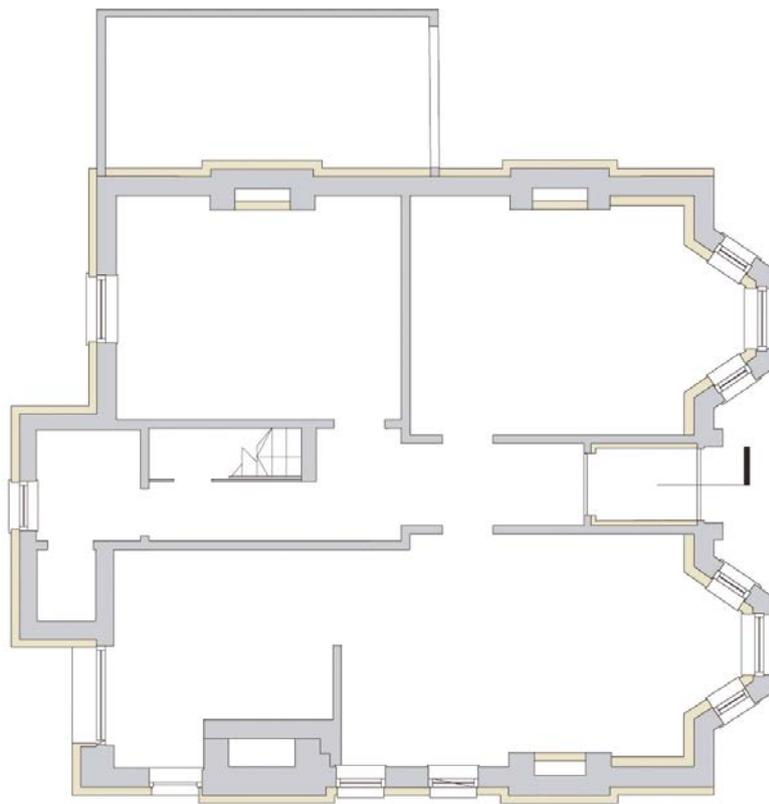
Ground floor plan - Marion Baeli and Paul Davis + Partners^{6,3}
